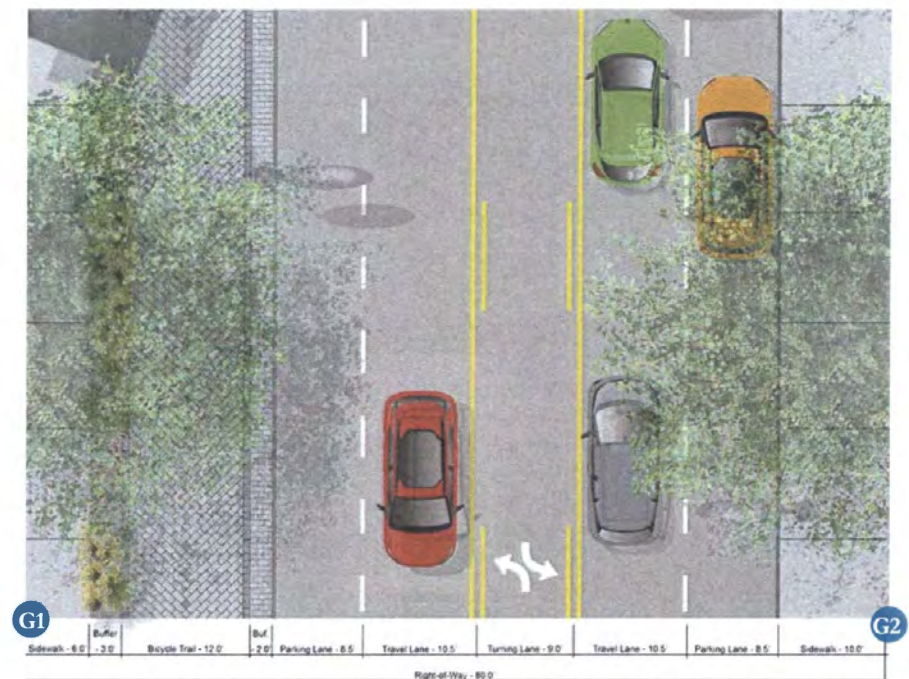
Prospect Avenue between East 8th St and Huron Rd Zoomed-In Plan
